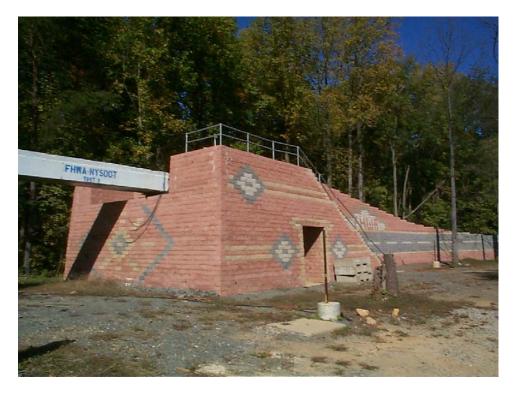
GRS Bridge Abutment Developed at the Turner-Fairbank Highway Research Center
